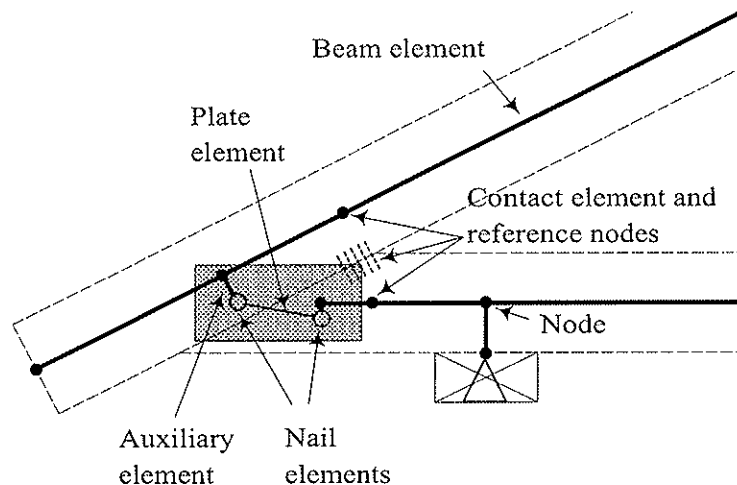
Heel joint used to explain the use of elements in TRUSSLAB.
